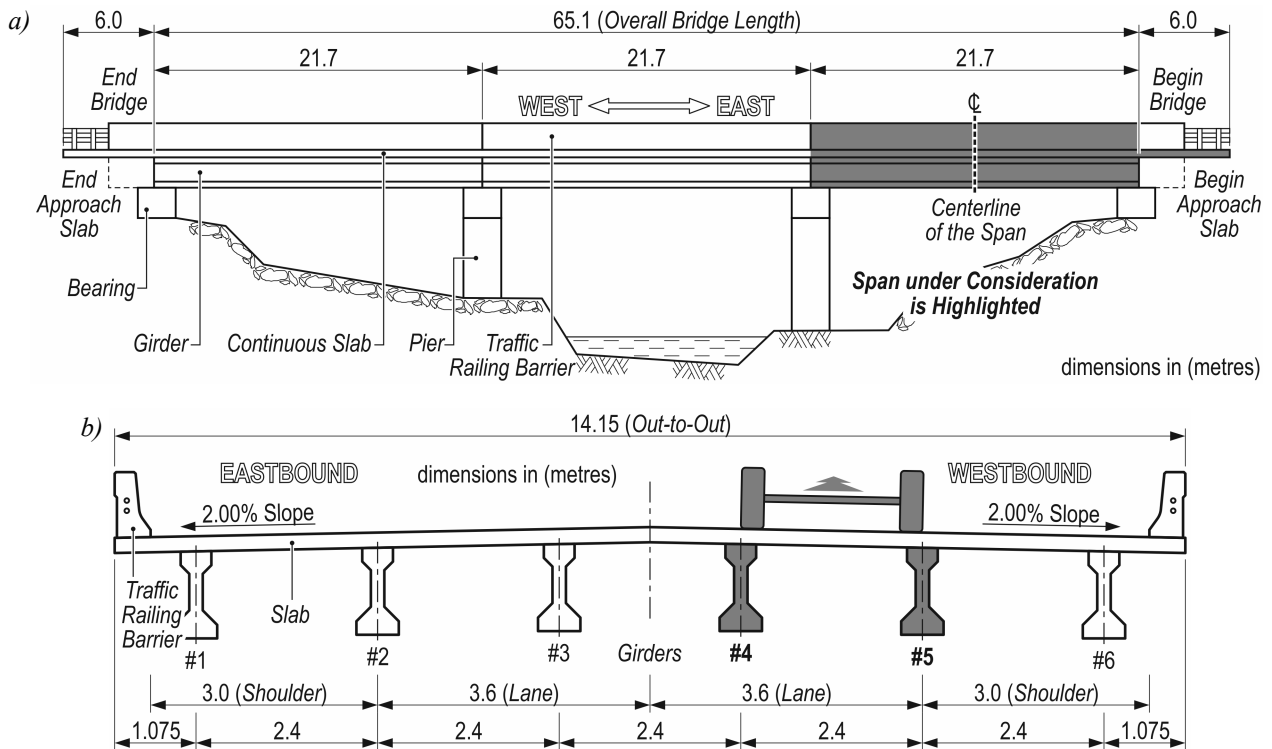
Bridge #500133 considered in the study: elevation of the bridge (a) and its cross-section (b) [9, 10]
